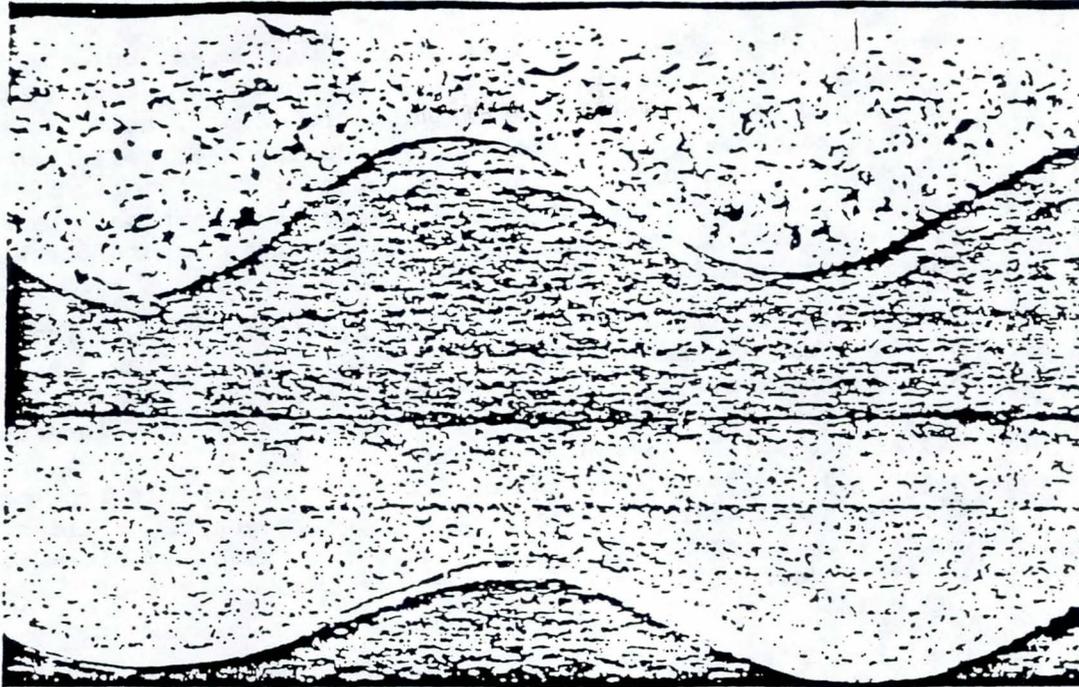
The upper section of the concrete lining was made by spinning the pipe; the lower section was made with the pipe stationary (Construction Products Division of Armco, Inc.)
